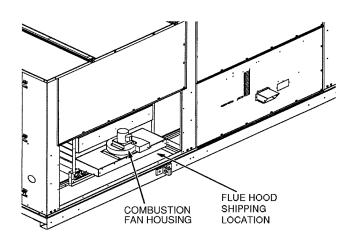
Combustion Fan Housing Location (48A2,A3,A4,A5020-050 Shown)
